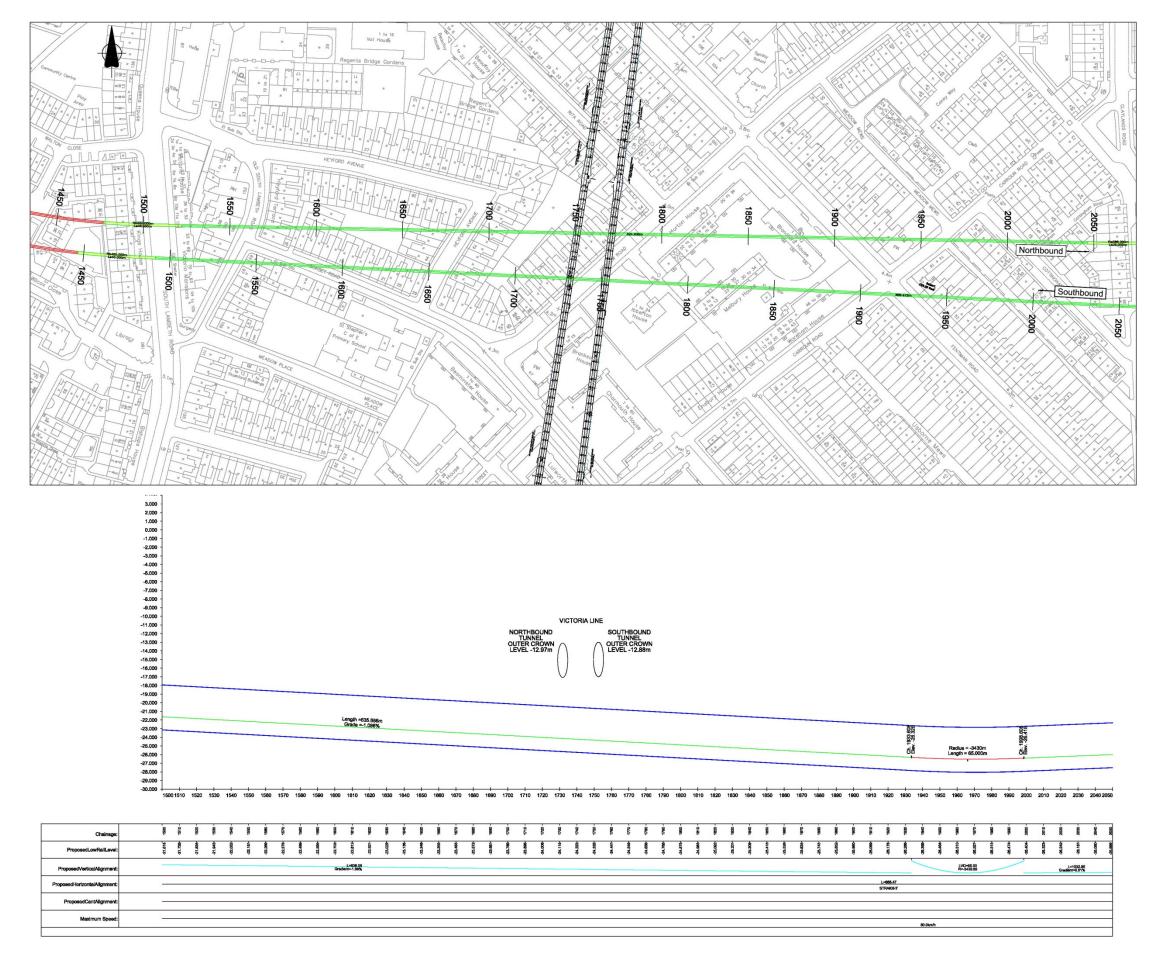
Northbound Horizontal and Vertical Track Alignment Sheet 10
